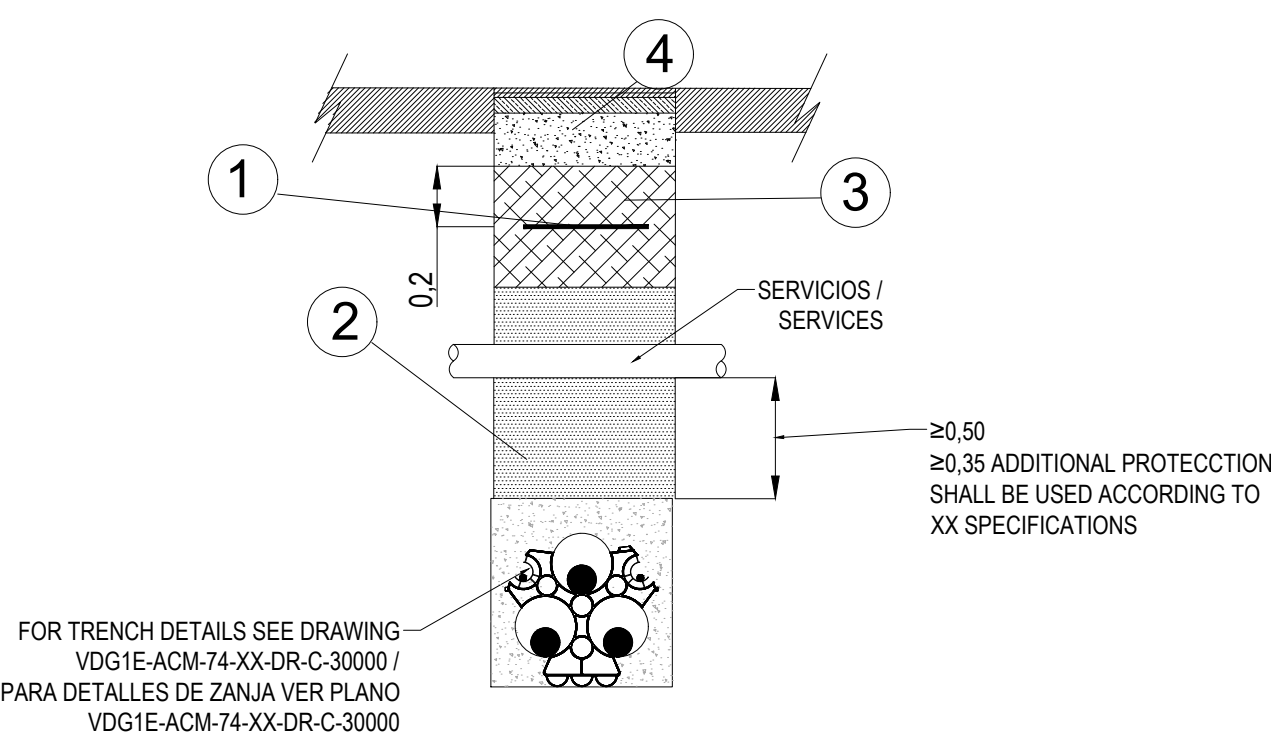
TYPICAL SECTION FOR PARALLEL SERVICES
